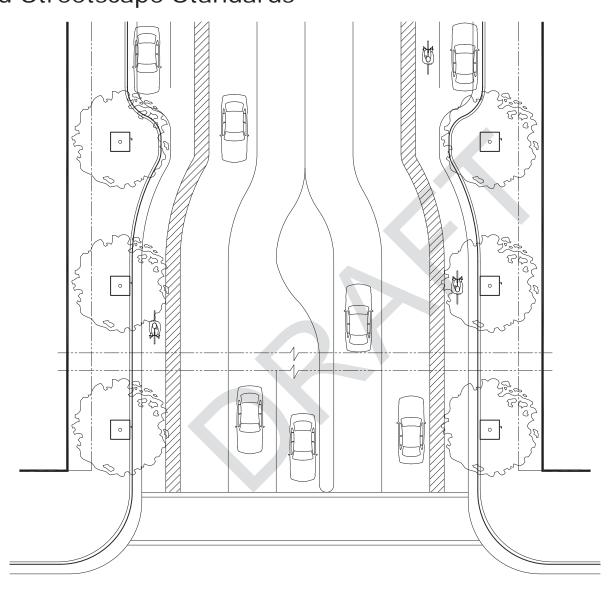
Street Type 2: Typical Intersection (Plan Perspective) [Update pending]
